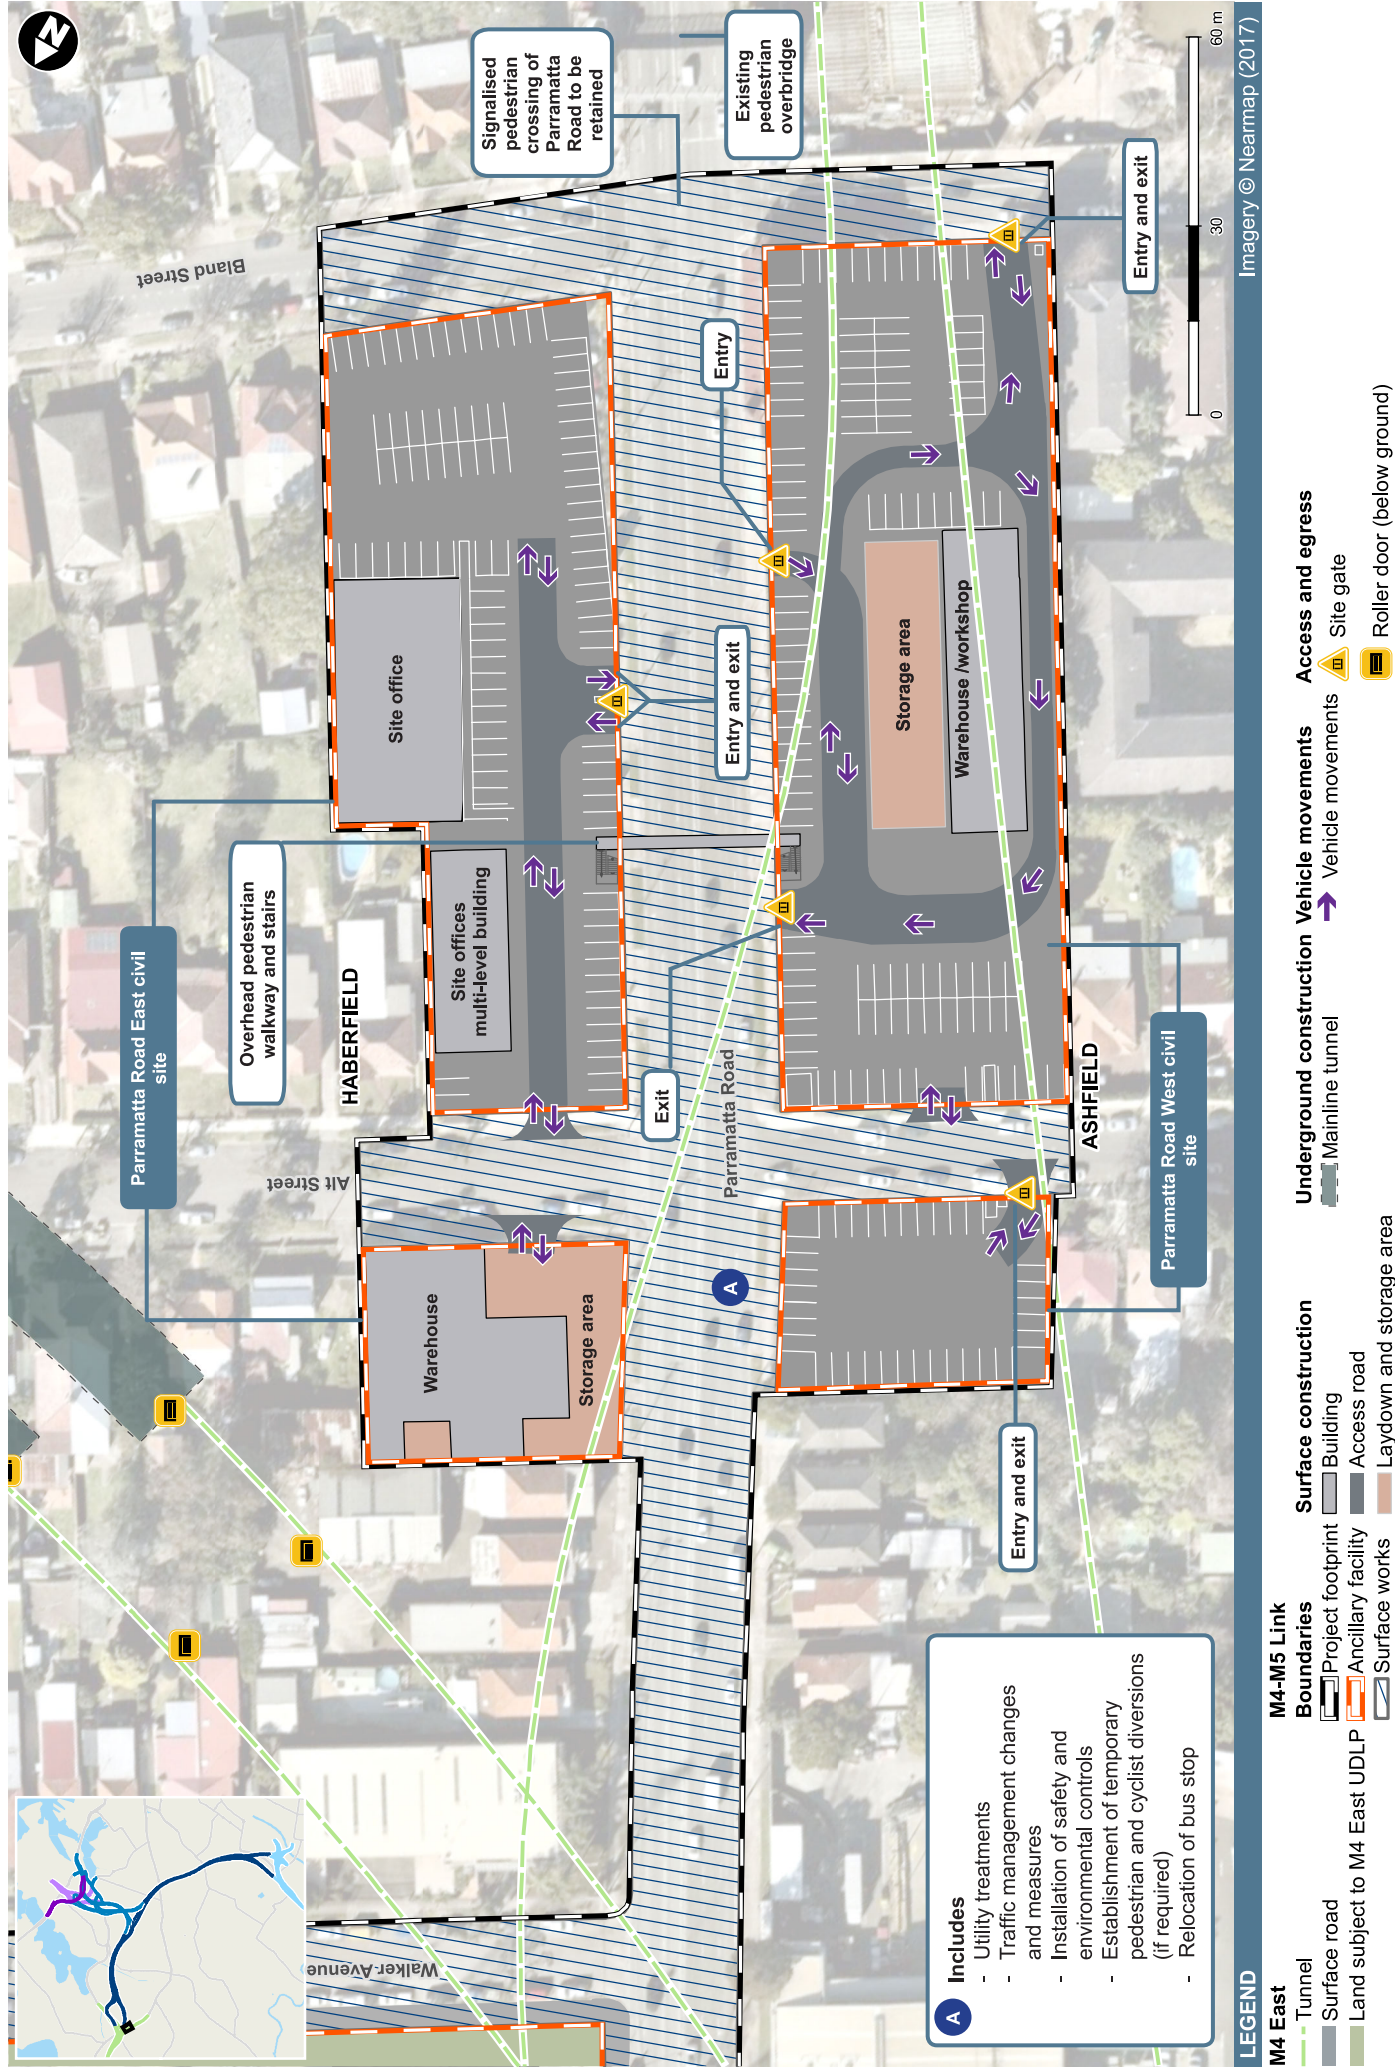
Indicative Parramatta Road West and Parramatta Road East site layouts
